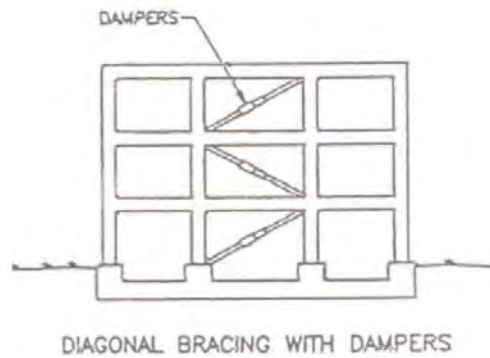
Method of connecting a diagonal connected to column beam of a flexible frame with beam of beside column
